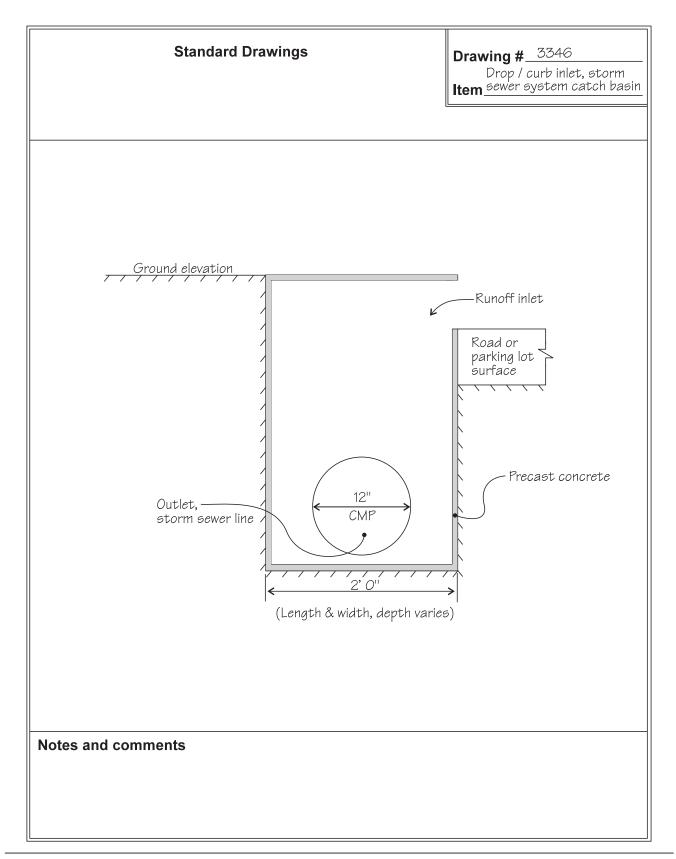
Standard drawing, section view, catch basin drop / curb inlet
